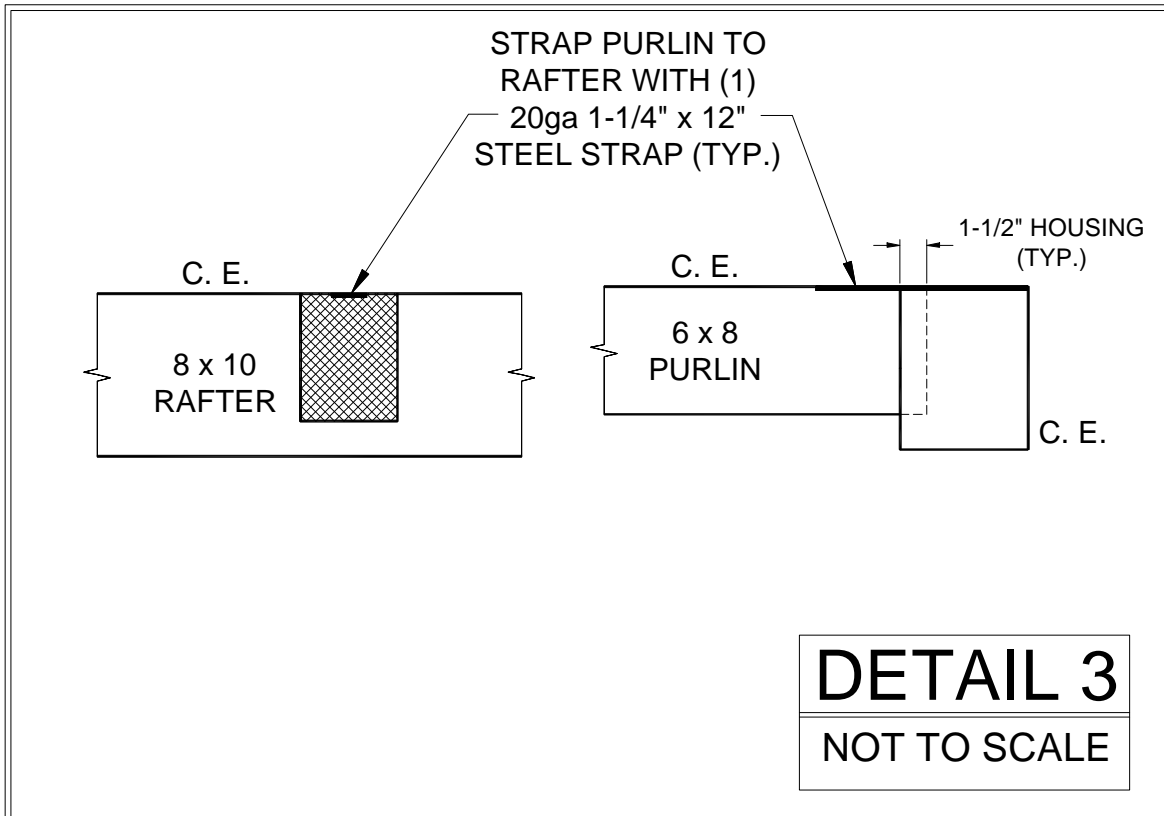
Example of typical end rafter to purlin joint consisting of a housing cut into the rafter into which the purlin fits and is held in place with a steel strap.
